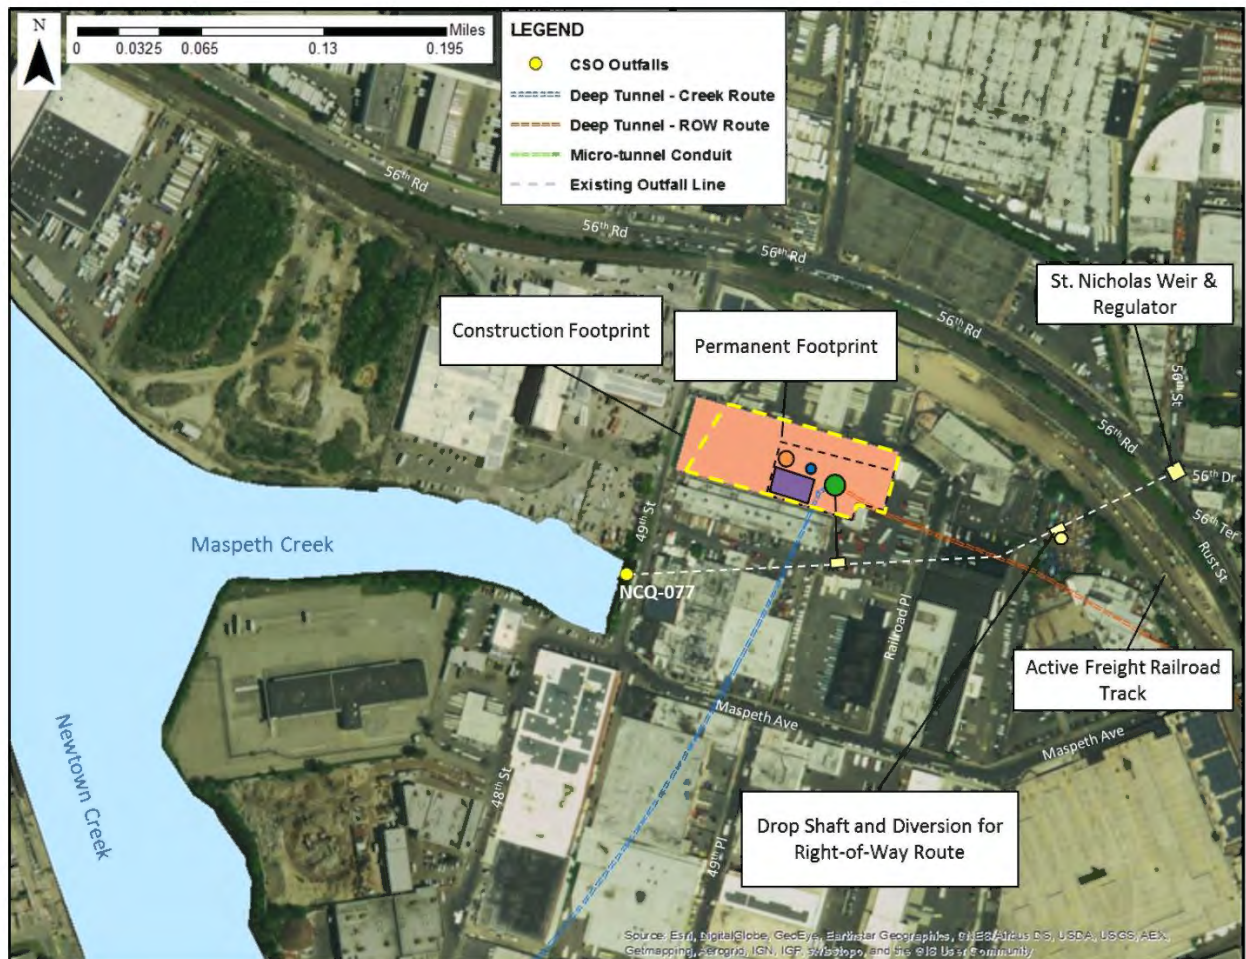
Details of Diversion Structures/Drop Shafts for Outfalls NC-077 (Shorter Tunnel)
